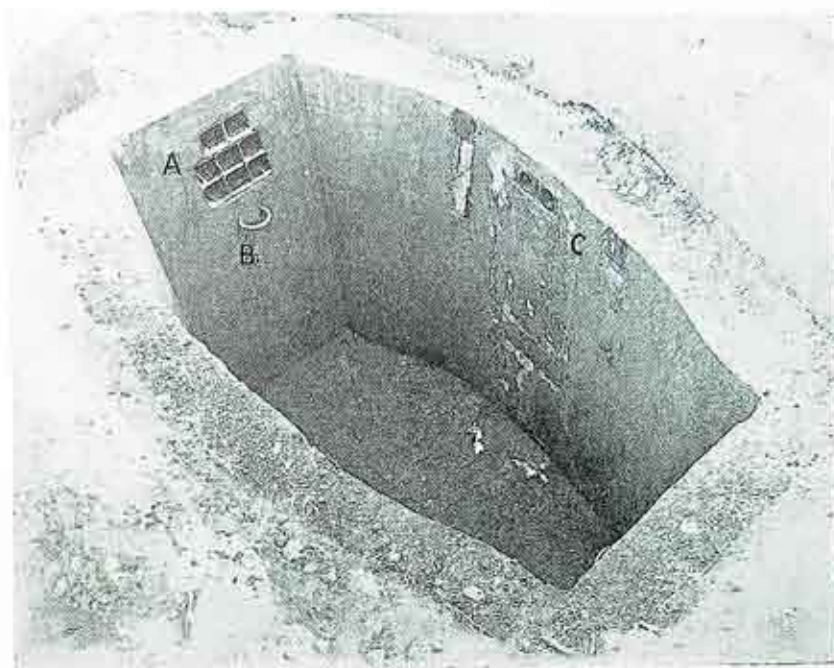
Completed Concrete Manhole, Ready for Cover to be Placed in Position. At A, B and C Respectively are Shown the Newly-Laid Cable Ducts, the Iron Ring Utilized in Drawing-in Cables, and the 2 Smaller Ducts which Supply the Current to the Street Lamps.
